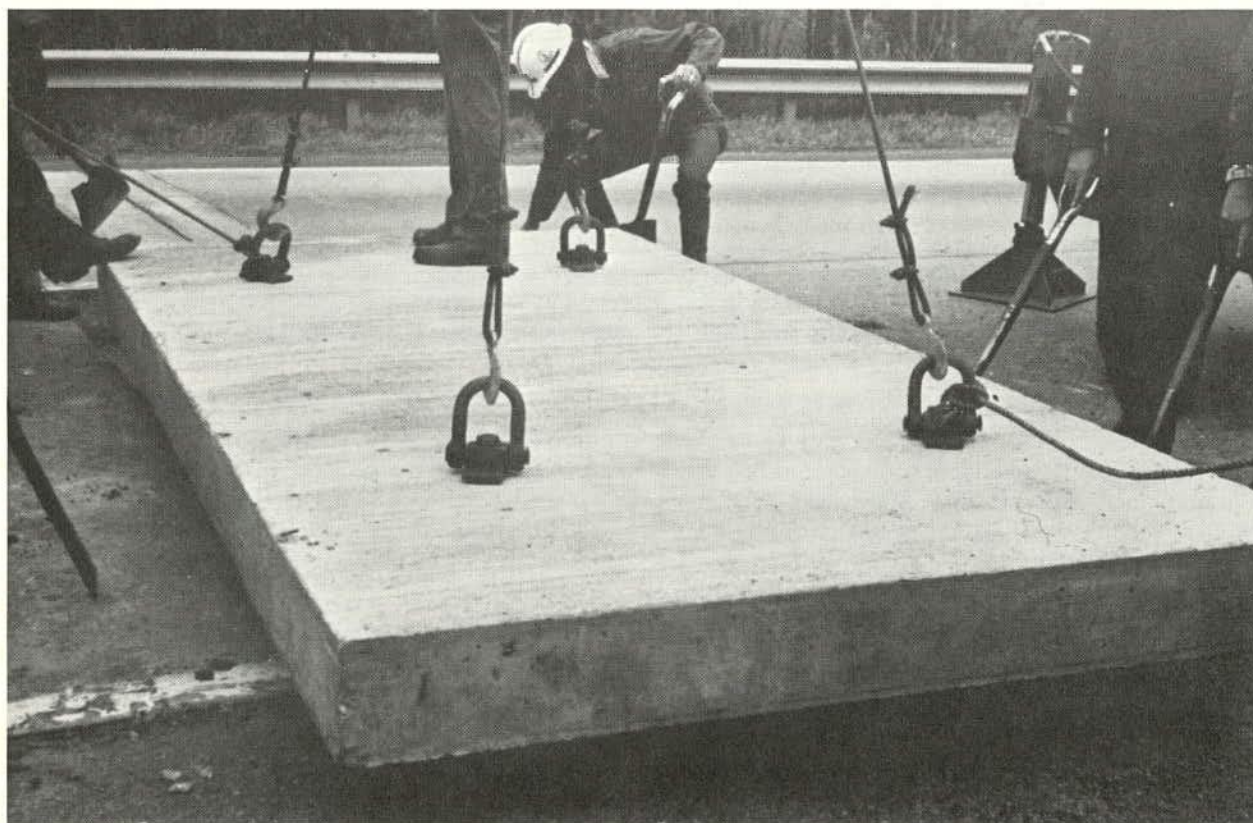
Full-width, full-depth precast concrete slab for pavement repair (Virginia).
